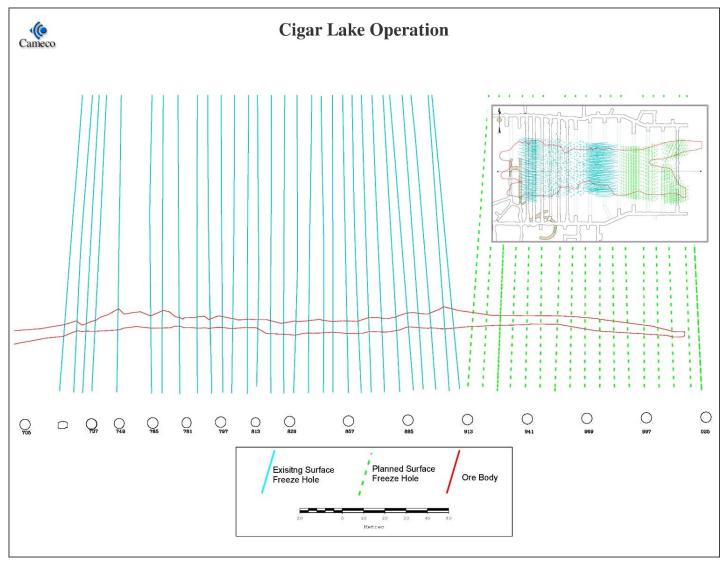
FREEZEHOLE ARRANGEMENT – SCHEMATIC VERTICAL SECTION LOOKING NORTH
